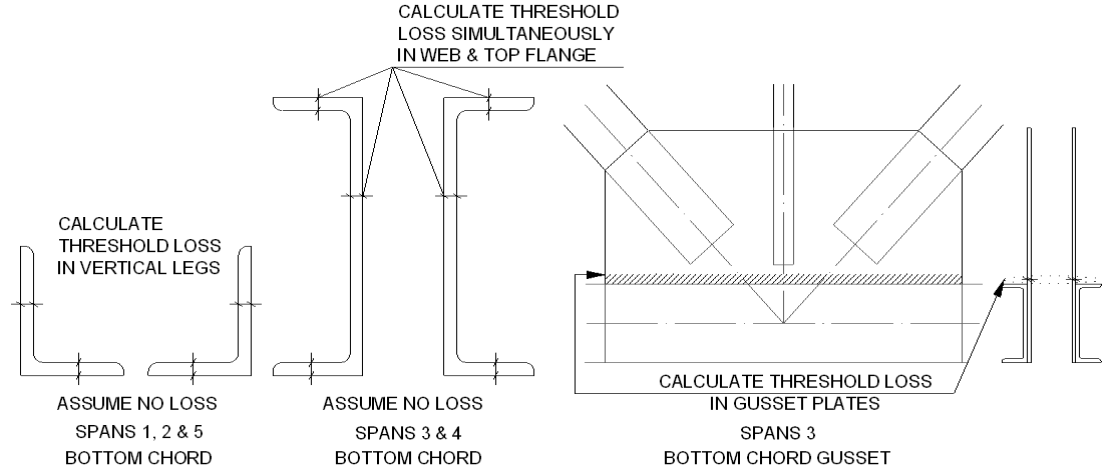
Truss System Section Loss and Corrosion Threshold
